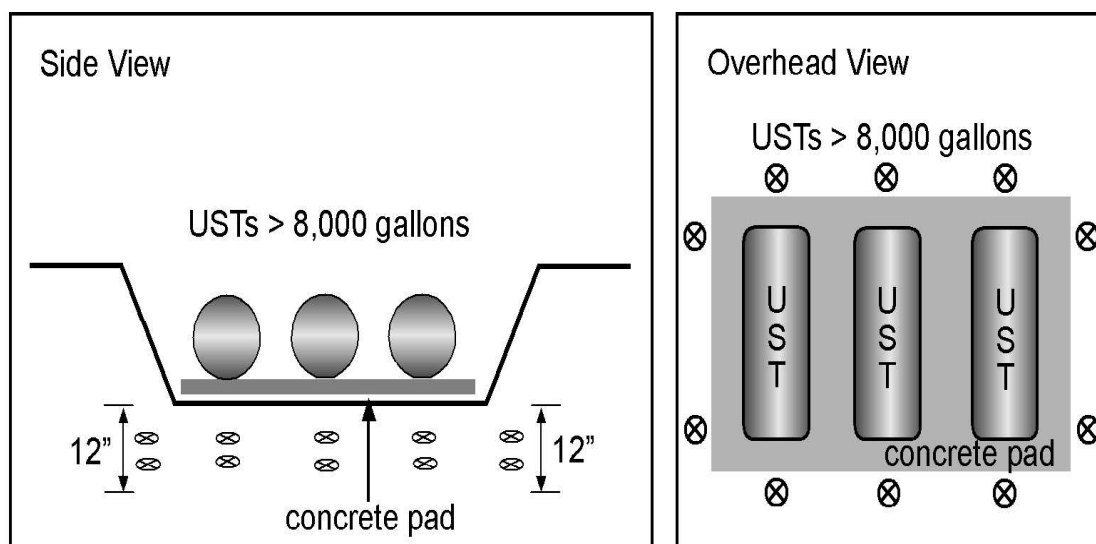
(d). Tank Excavation Sampling for Multiple Tanks Greater Than 8,000 Gallons Resting on a Concrete Pad
